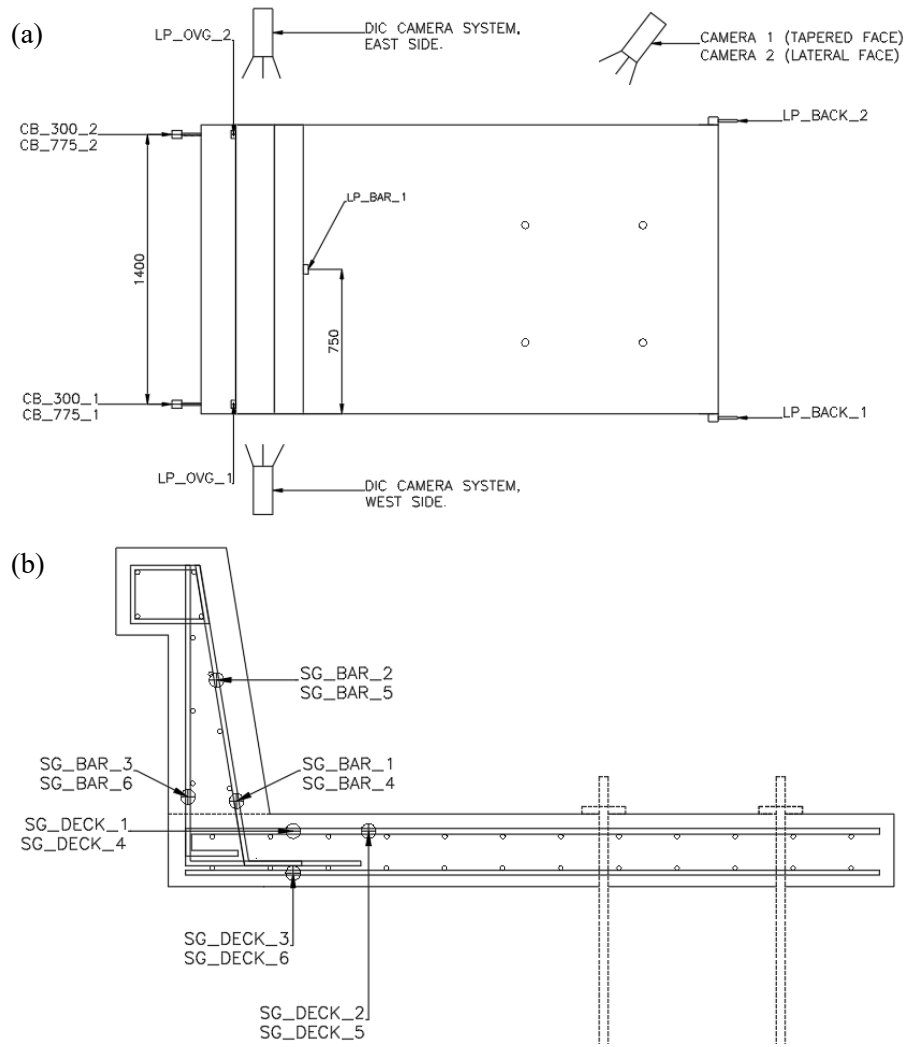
Location and labelling of sensors used for specimen testing. (a) cameras and deflection sensors, and (b) strain gauges. All dimensions in mm.
